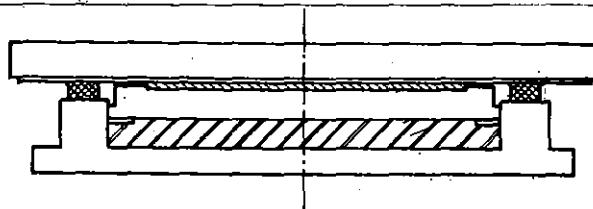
Rubber 'Pot' bearing (disc bearing)
